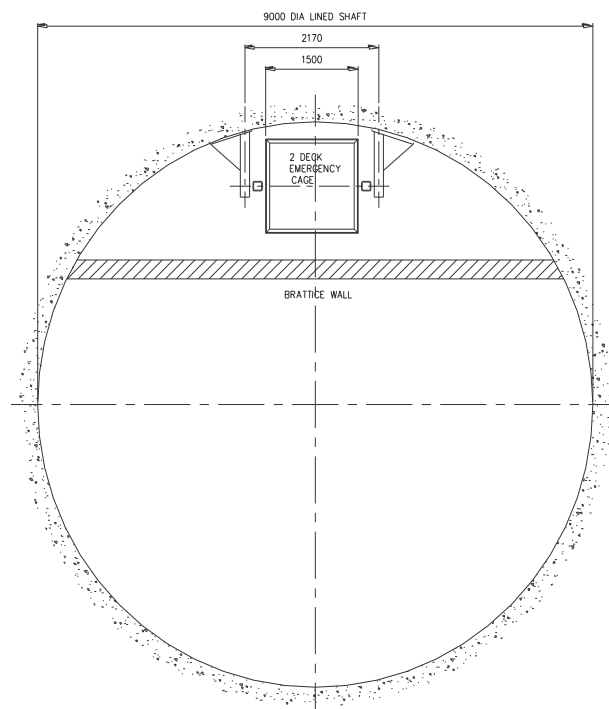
CROSS SECTION OF THE VENTILATION SHAFT
